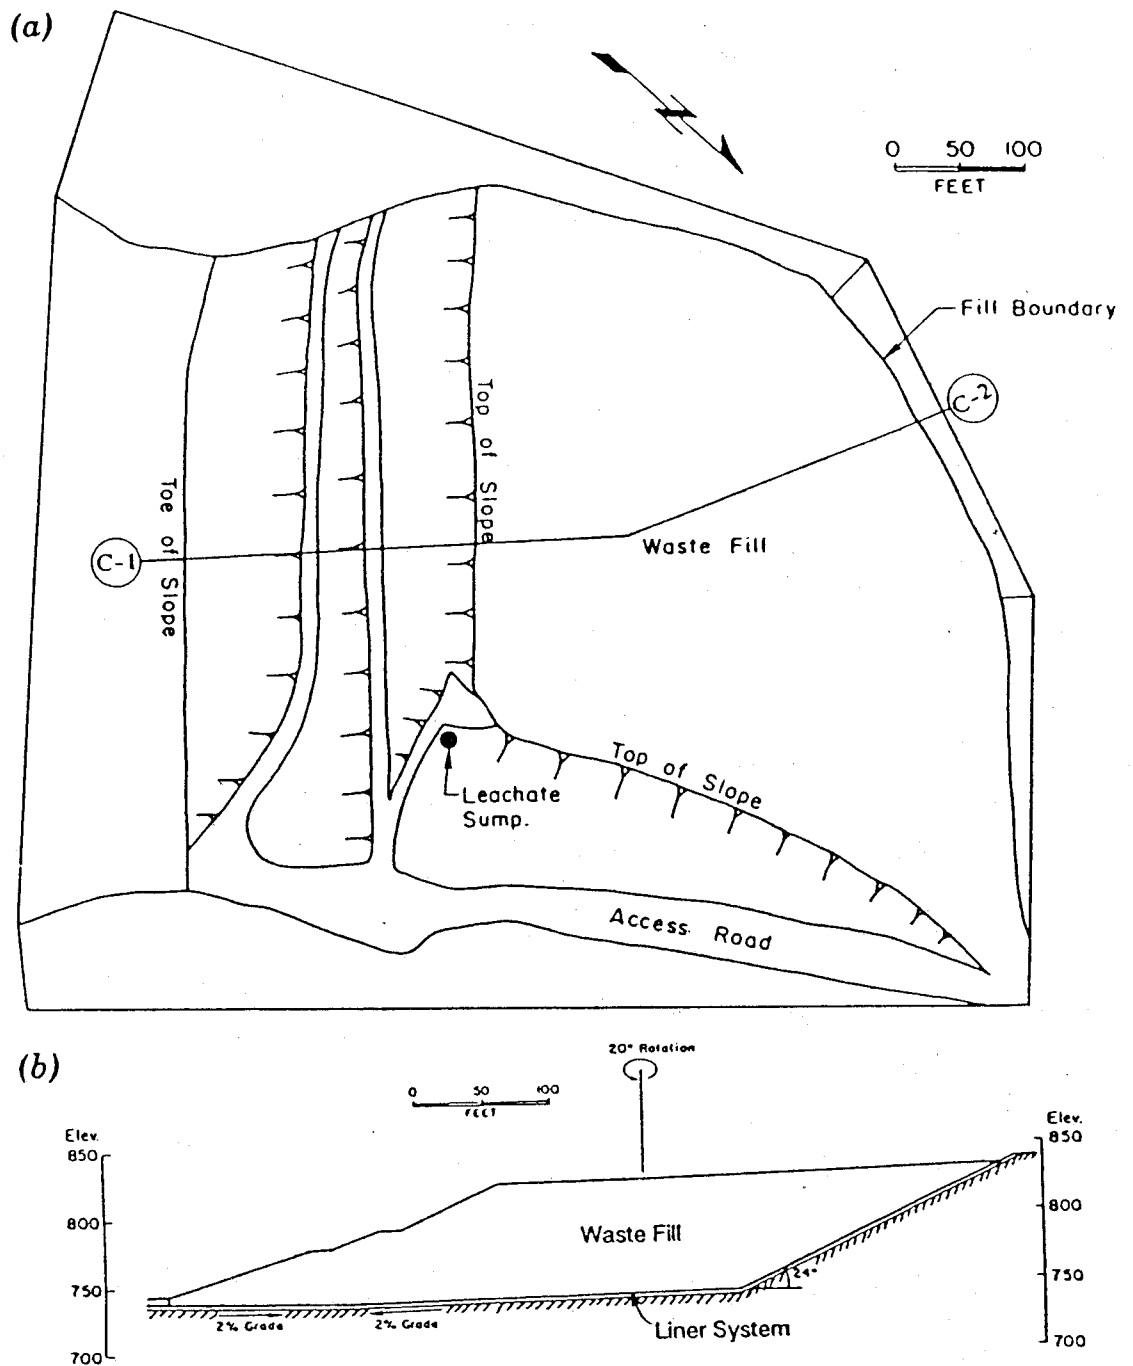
Preslide Surface Topography and Cross Section C-1/C-2 for the Unit B-19, Phase I-A Landfill (March 15, 1988): (a) Surface Topography, March 15, 1988; and (b) Cross section C-1/C-2
